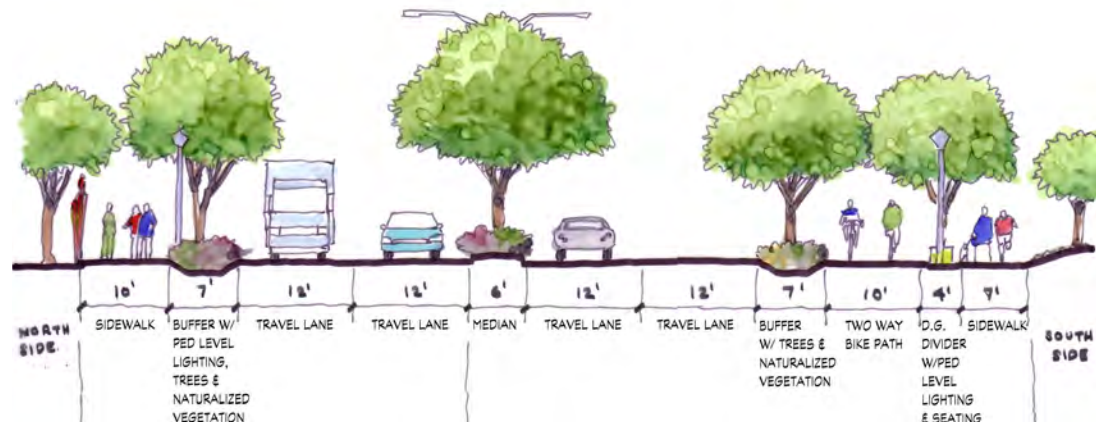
Hudson Avenue Roadway Improvement Concept
